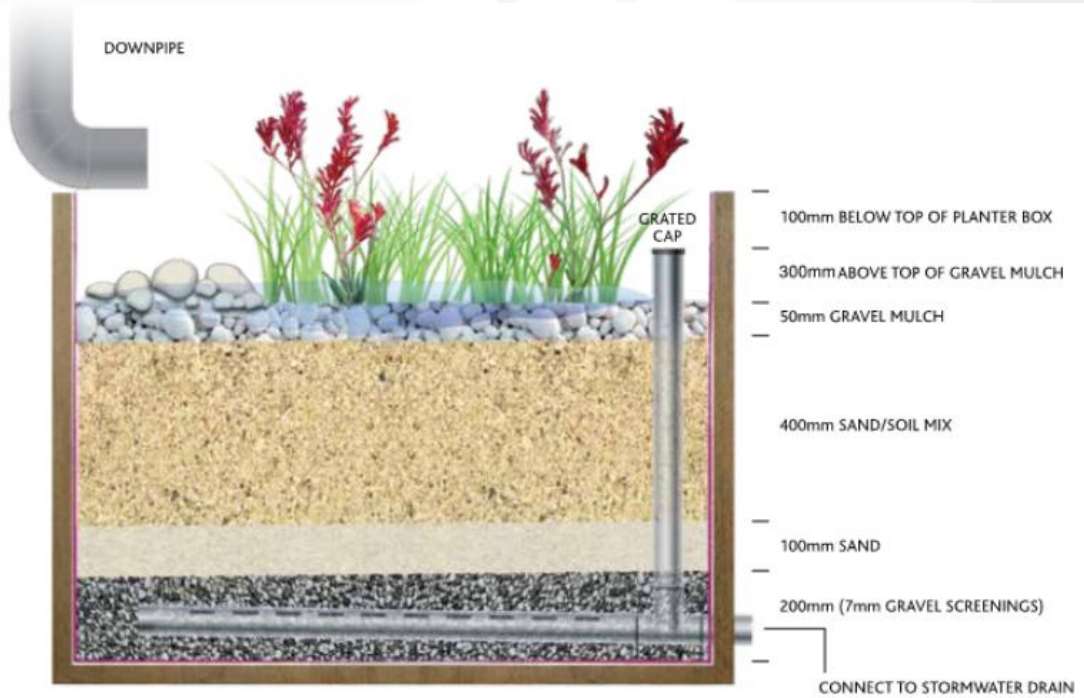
Typical Planter Box Raingarden Detail – Just representative, not for construction
